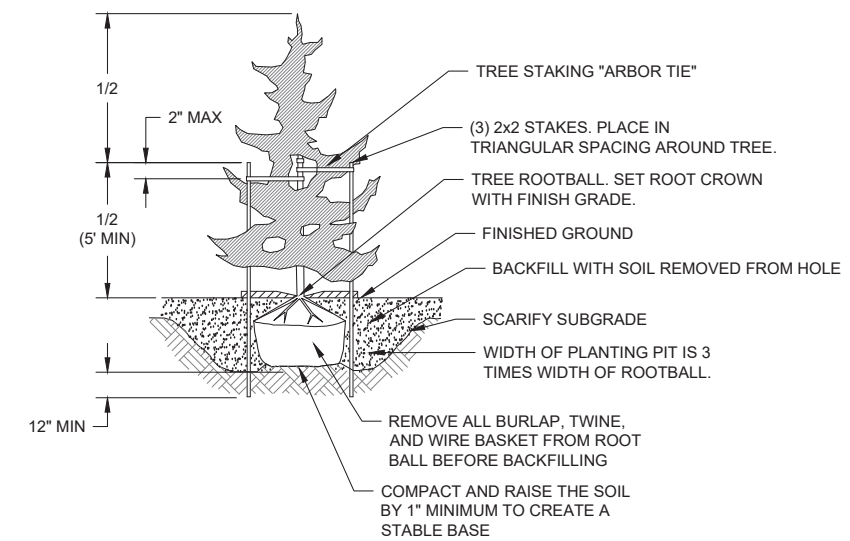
DETAIL - CONTAINER TREE AND SHRUB PLANTING
